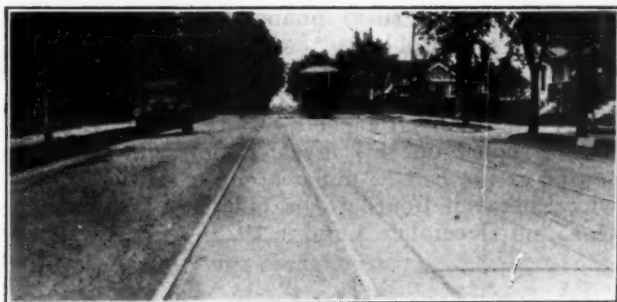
CONCRETE PAVEMENT ON DOWNING STREET.
